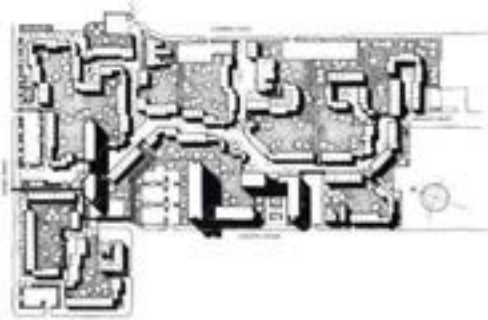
The master plan of Alexandra Park revolves around the central, curving Vanauley Walk and separates pedestrians from cars by placing parking lots on the perimeter (source: Jerome Markson Architects, 1968).
